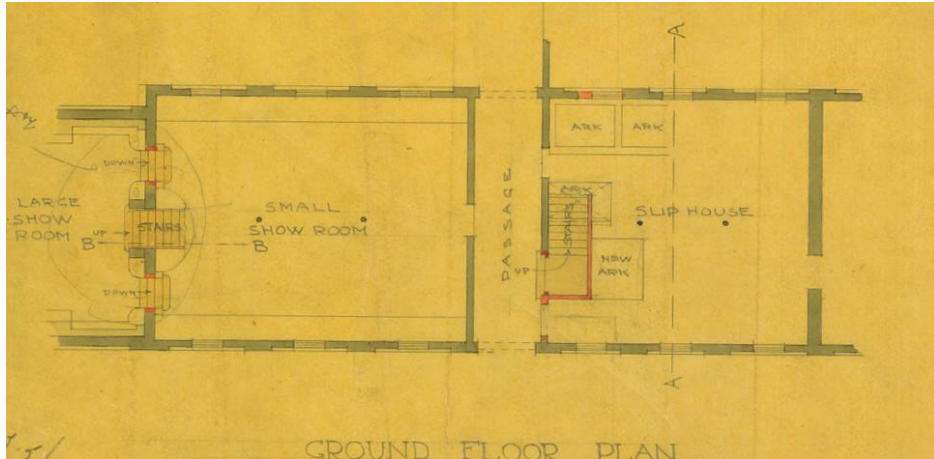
The ground floor of Building A as planned by Thomas Sutton c1900 (source: Worcester Porcelain Museum)
